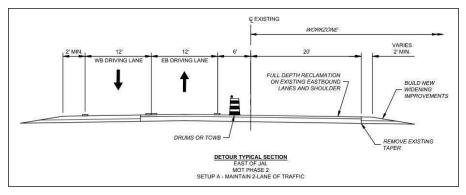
D. NM 128 MOT Typical Section – Enhanced Two-Lane Construction
